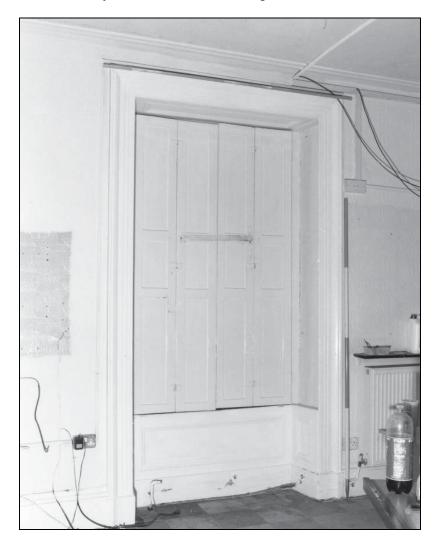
The 19th century house: detail of shuttered window, to east side of south-east ground floor room
